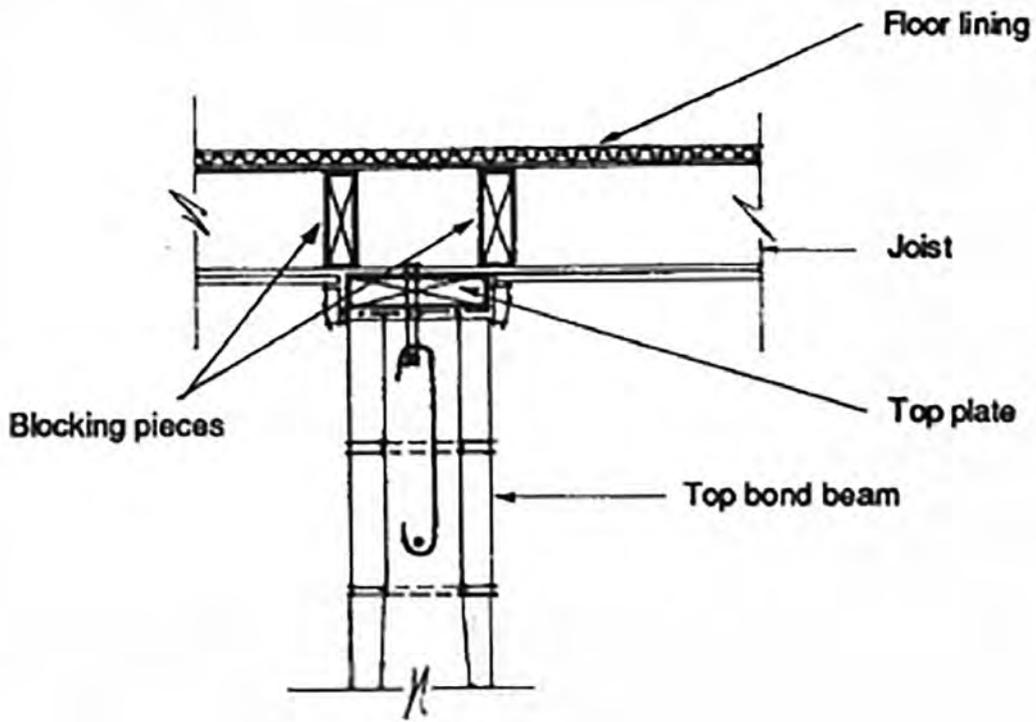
DETAIL OF MASONRY WALL WITH TIMBER FLOOR - PERPENDICULAR TO JOISTS
